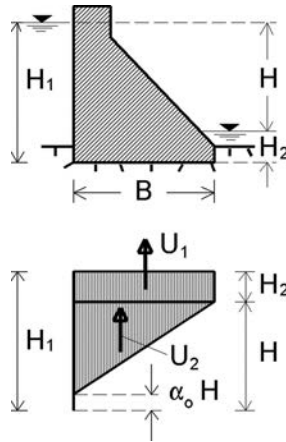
Uplift forces on a concrete dam on rock foundations.
